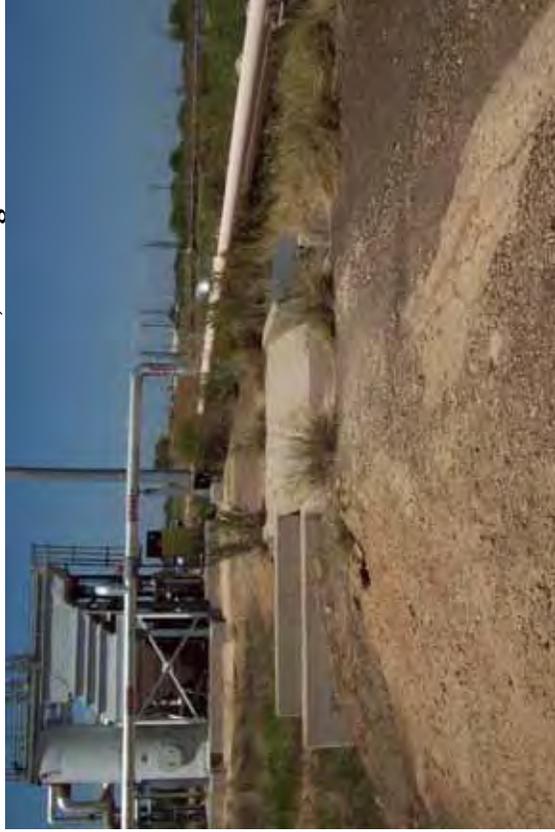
SP - Spillway between SRH Pond and South Bottom Ash Pond at west embankment crest, looking north.
